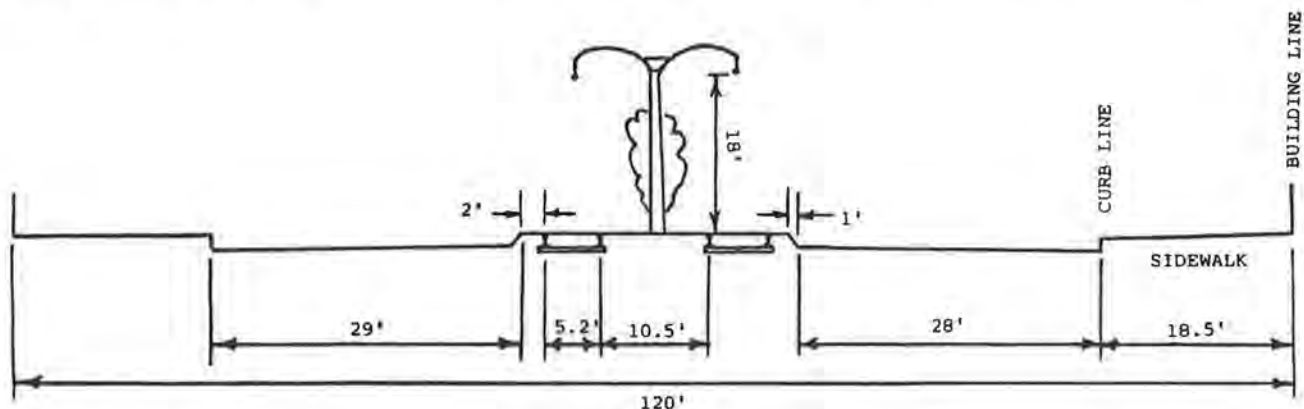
Cross section of Allegheny Avenue light rail project.
